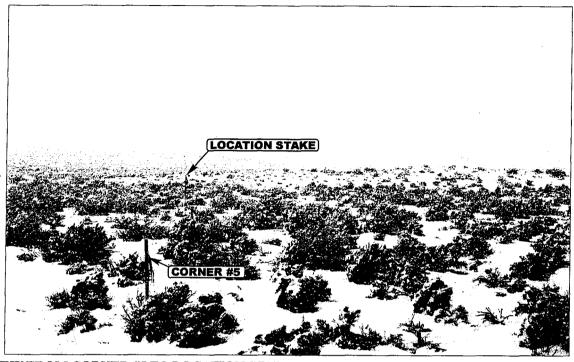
PHOTO: VIEW FROM CORNER #5 TO LOCATION STAKE
